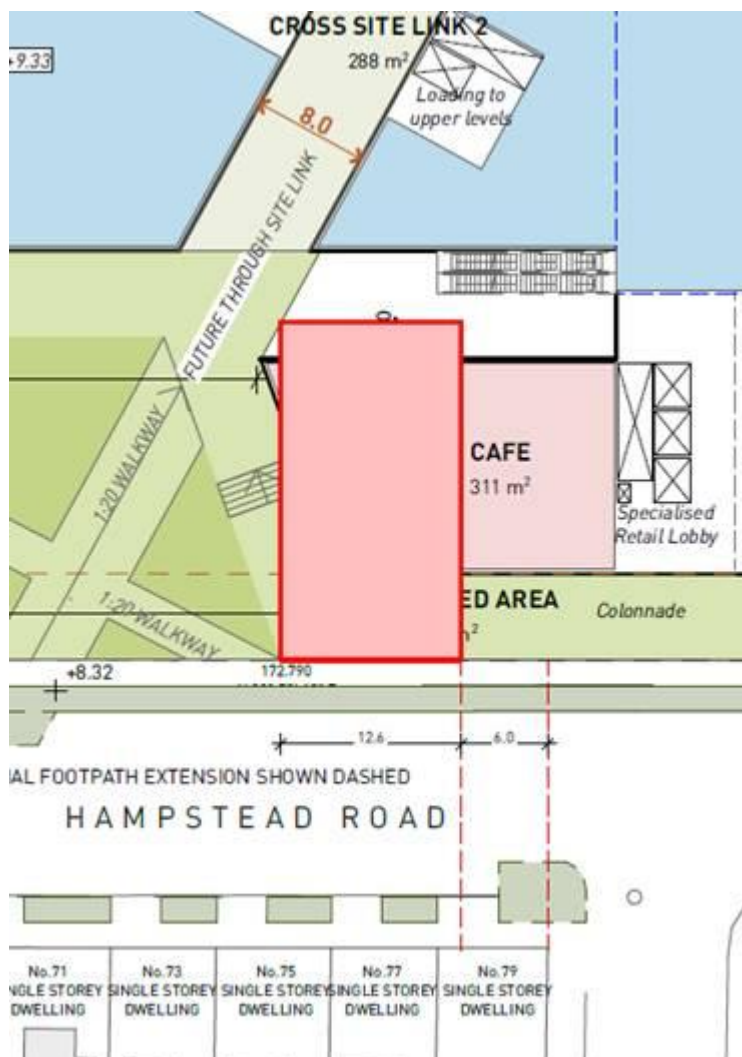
ALTERNATE DRIVEWAY LOCATION - NOT FEASIBLE DUE TO CONFLICT WITH STORMWATER CULVERT, FLOODING AND PEDESTRIAN CIRCULATION
